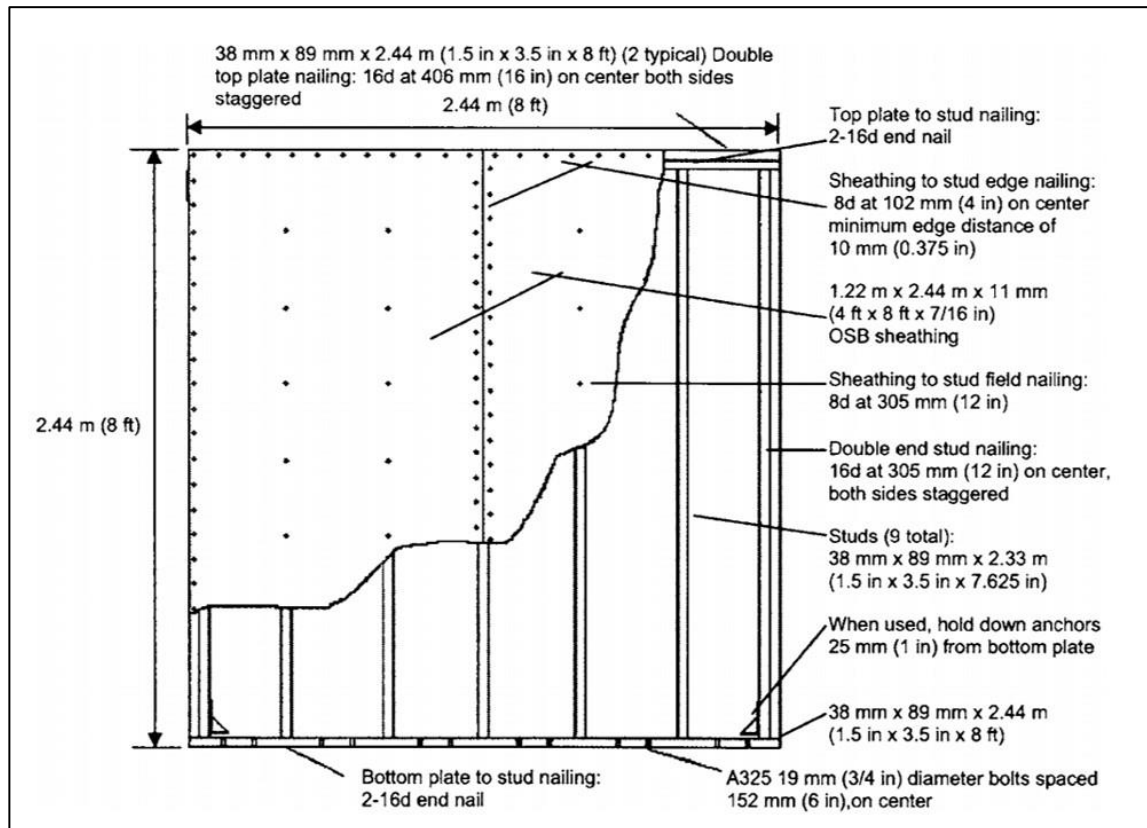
Typical shear wall specimen (Lebeda et al., 2005)
